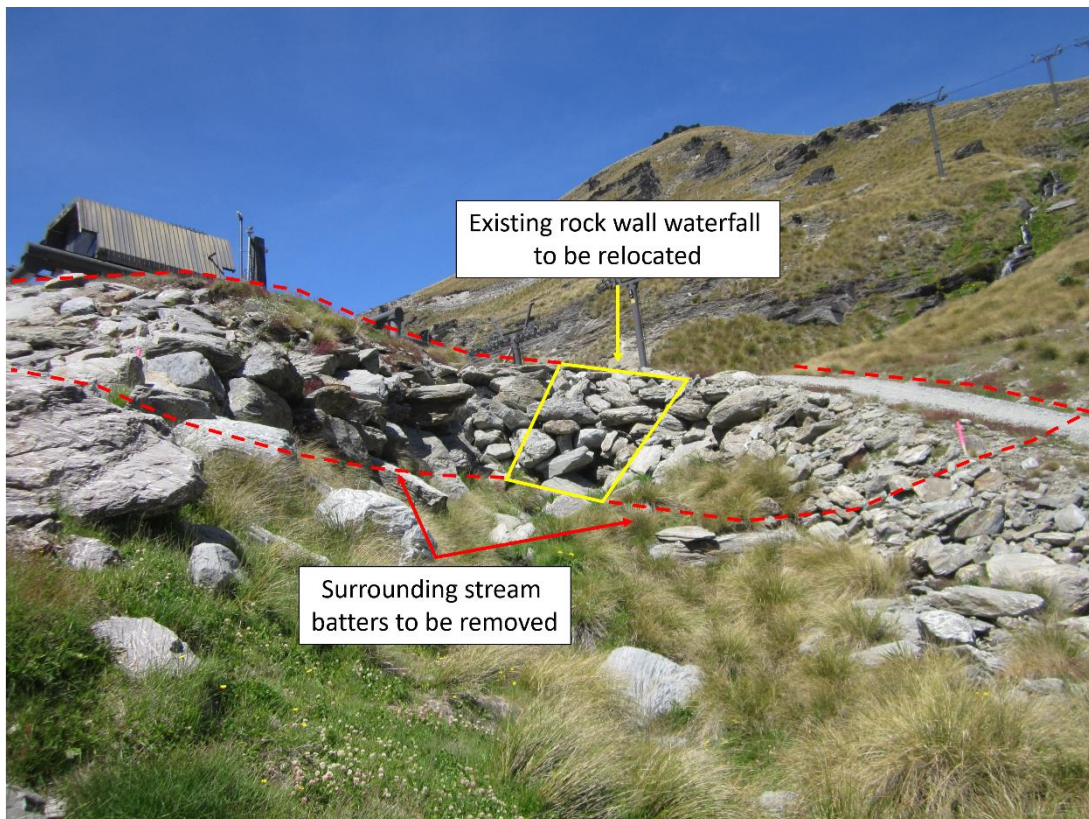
Photograph looking upstream showing the location of the proposed rock wall waterfall.
